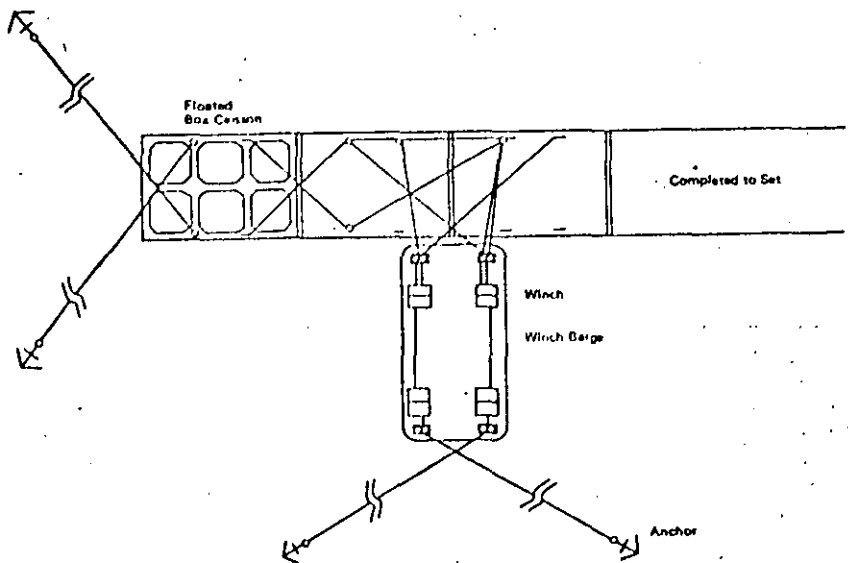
Setting Operation of Box Caisson by Winch Barge
